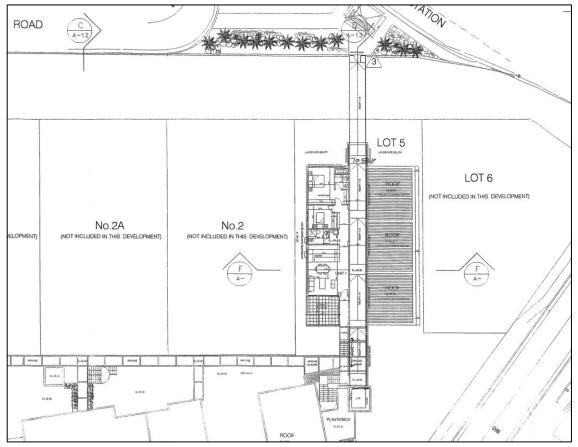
Approved floor plan of unit 1 under DA-332/2000.
